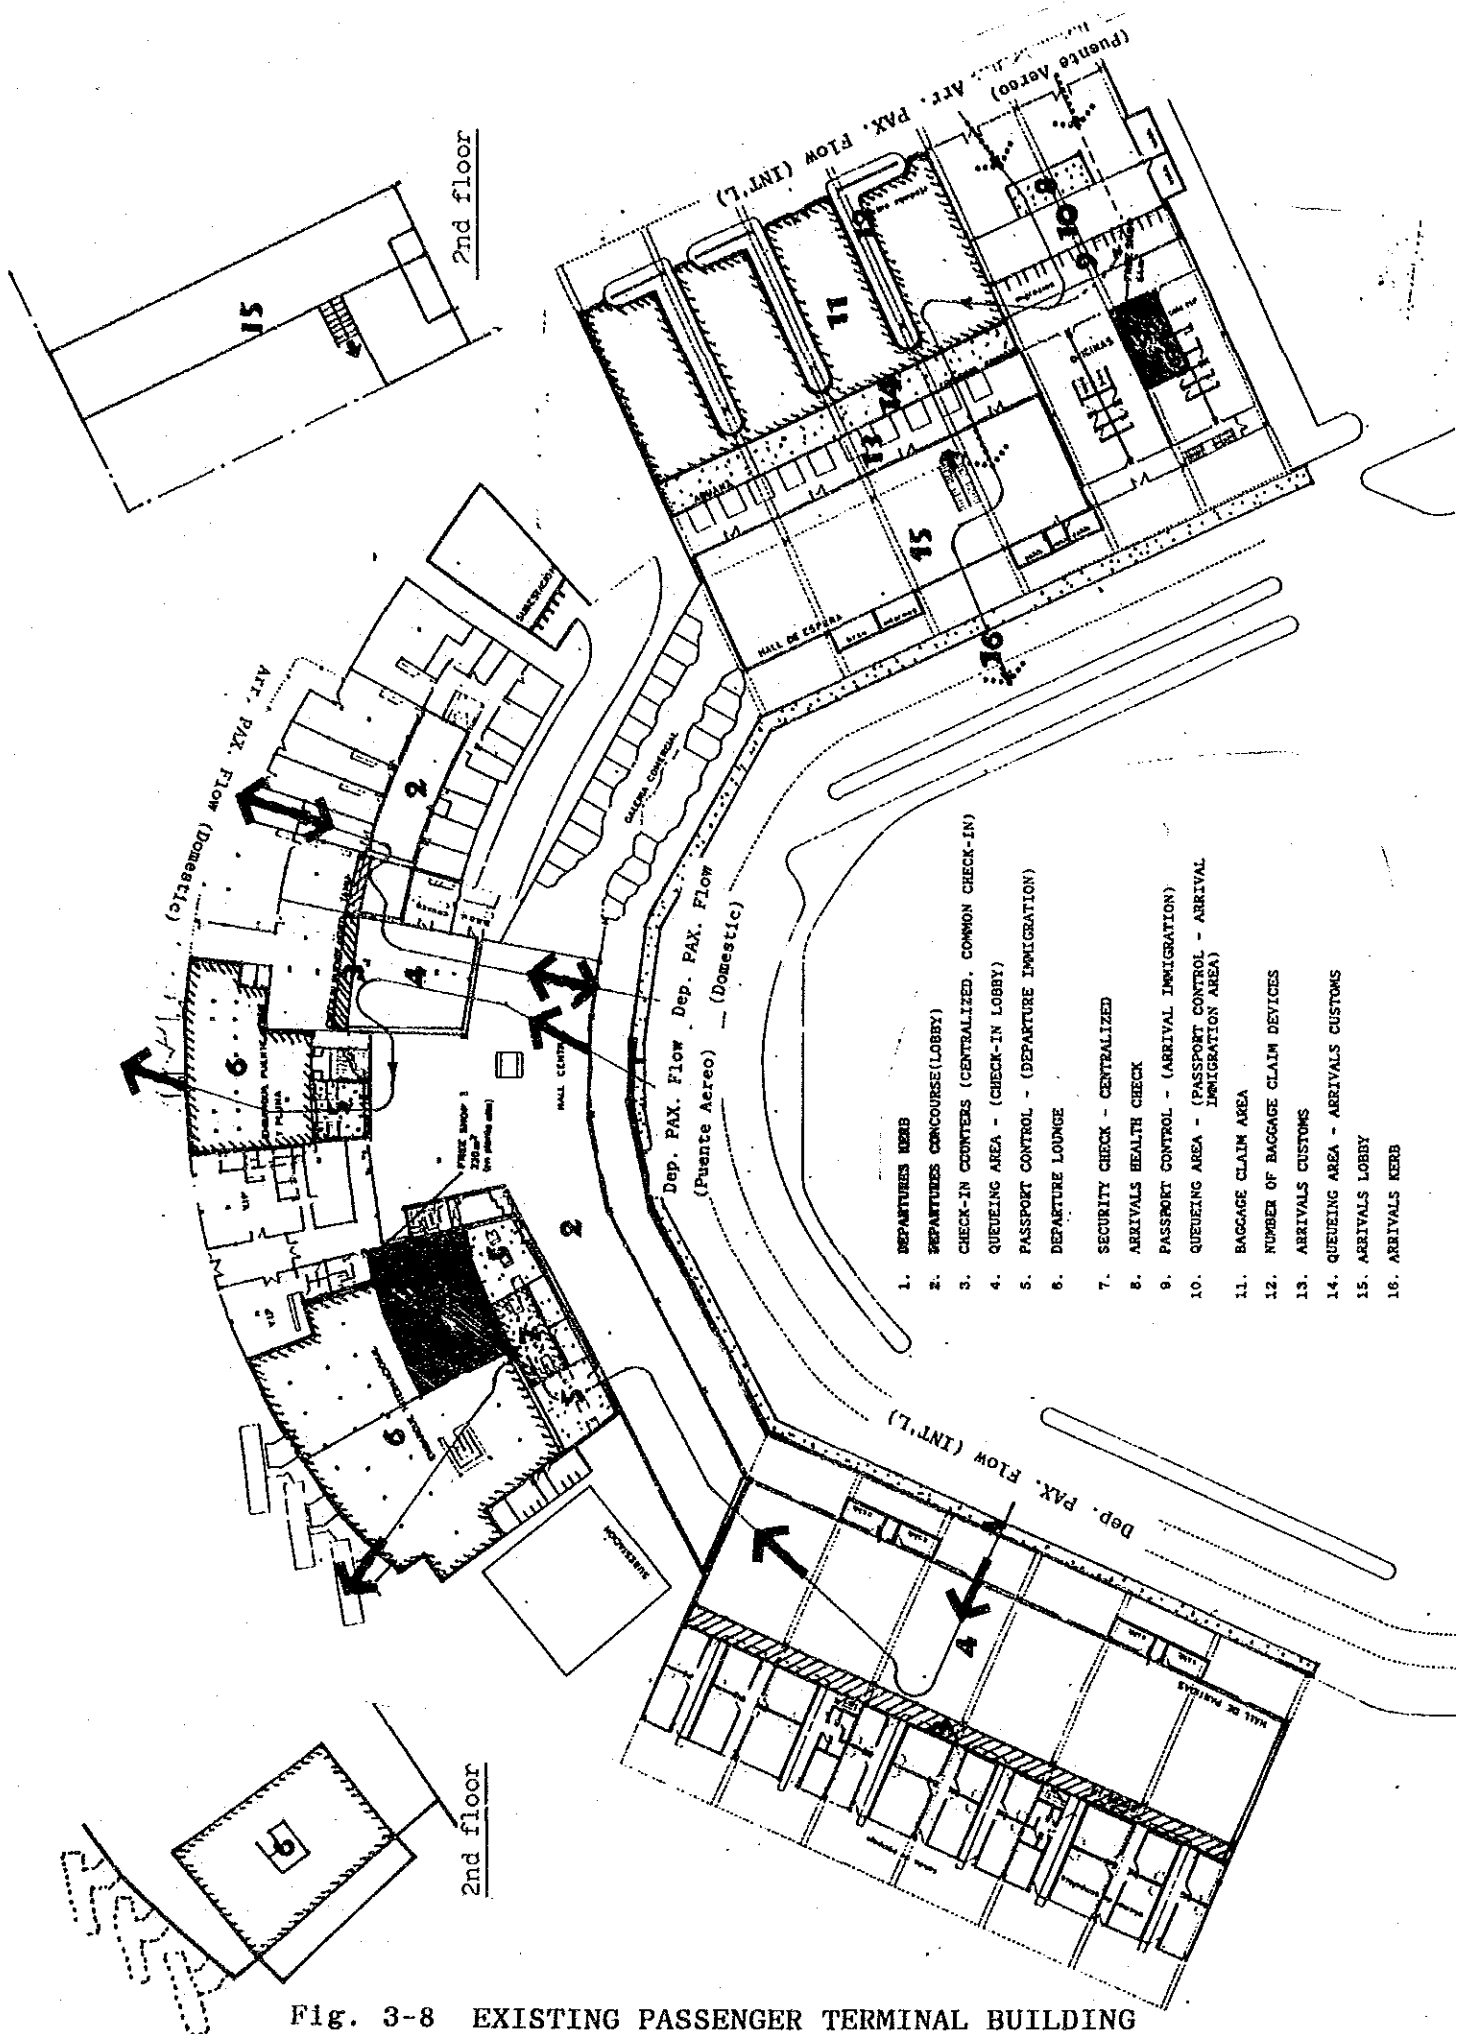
EXISTING PASSENGER TERMINAL BUILDING
